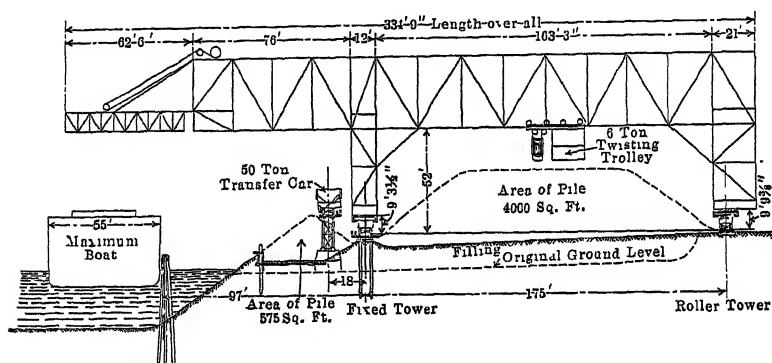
SECTION THROUGH ORE- AND COAL-STORAGE YARD
